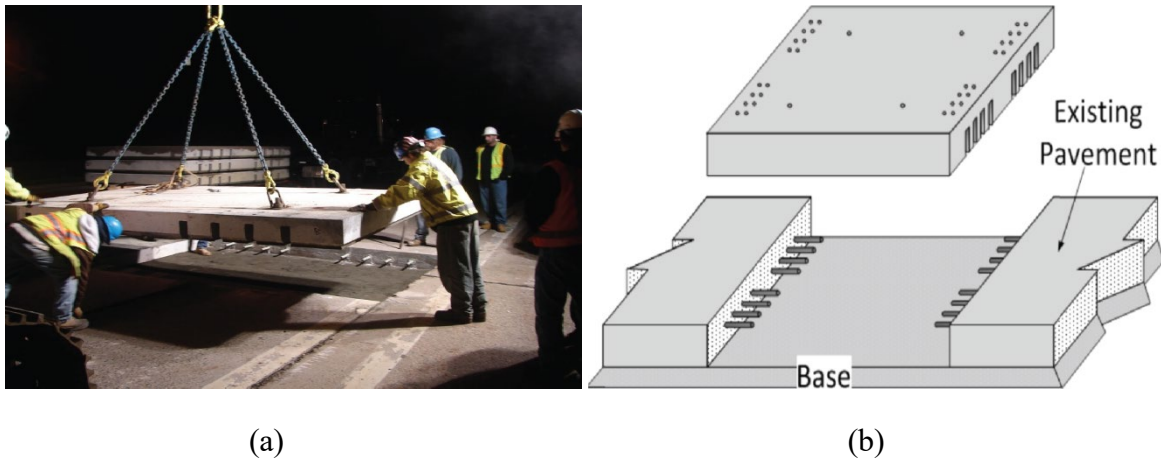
Intermittent Repair Application for Existing Concrete Pavement
